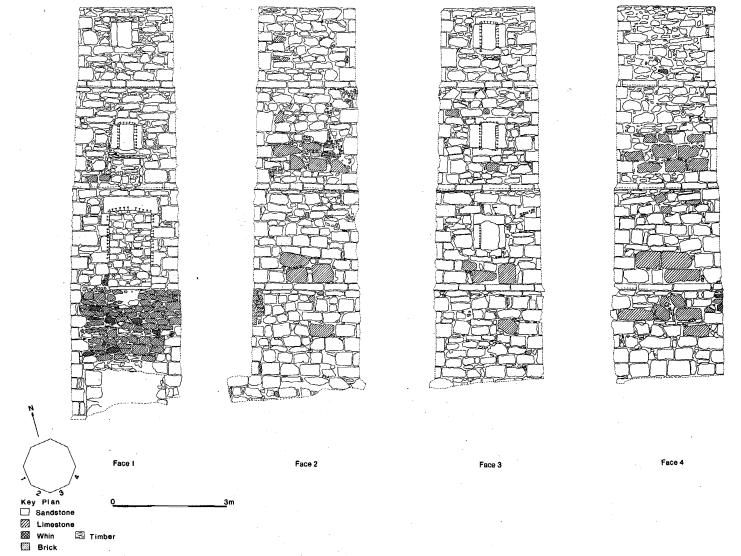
Berwick Bell Tower: elevations of faces 1-4.
